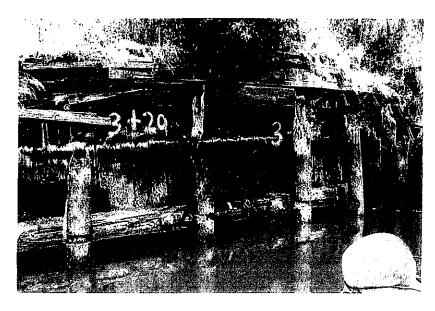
STA 3+20 TIMBER BULKHEAD
